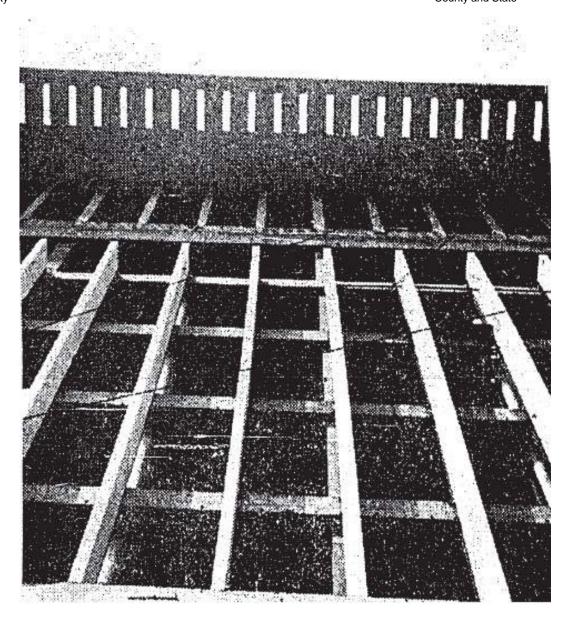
Detailed view of facade under construction (Washington Post, September 1, 1962)
